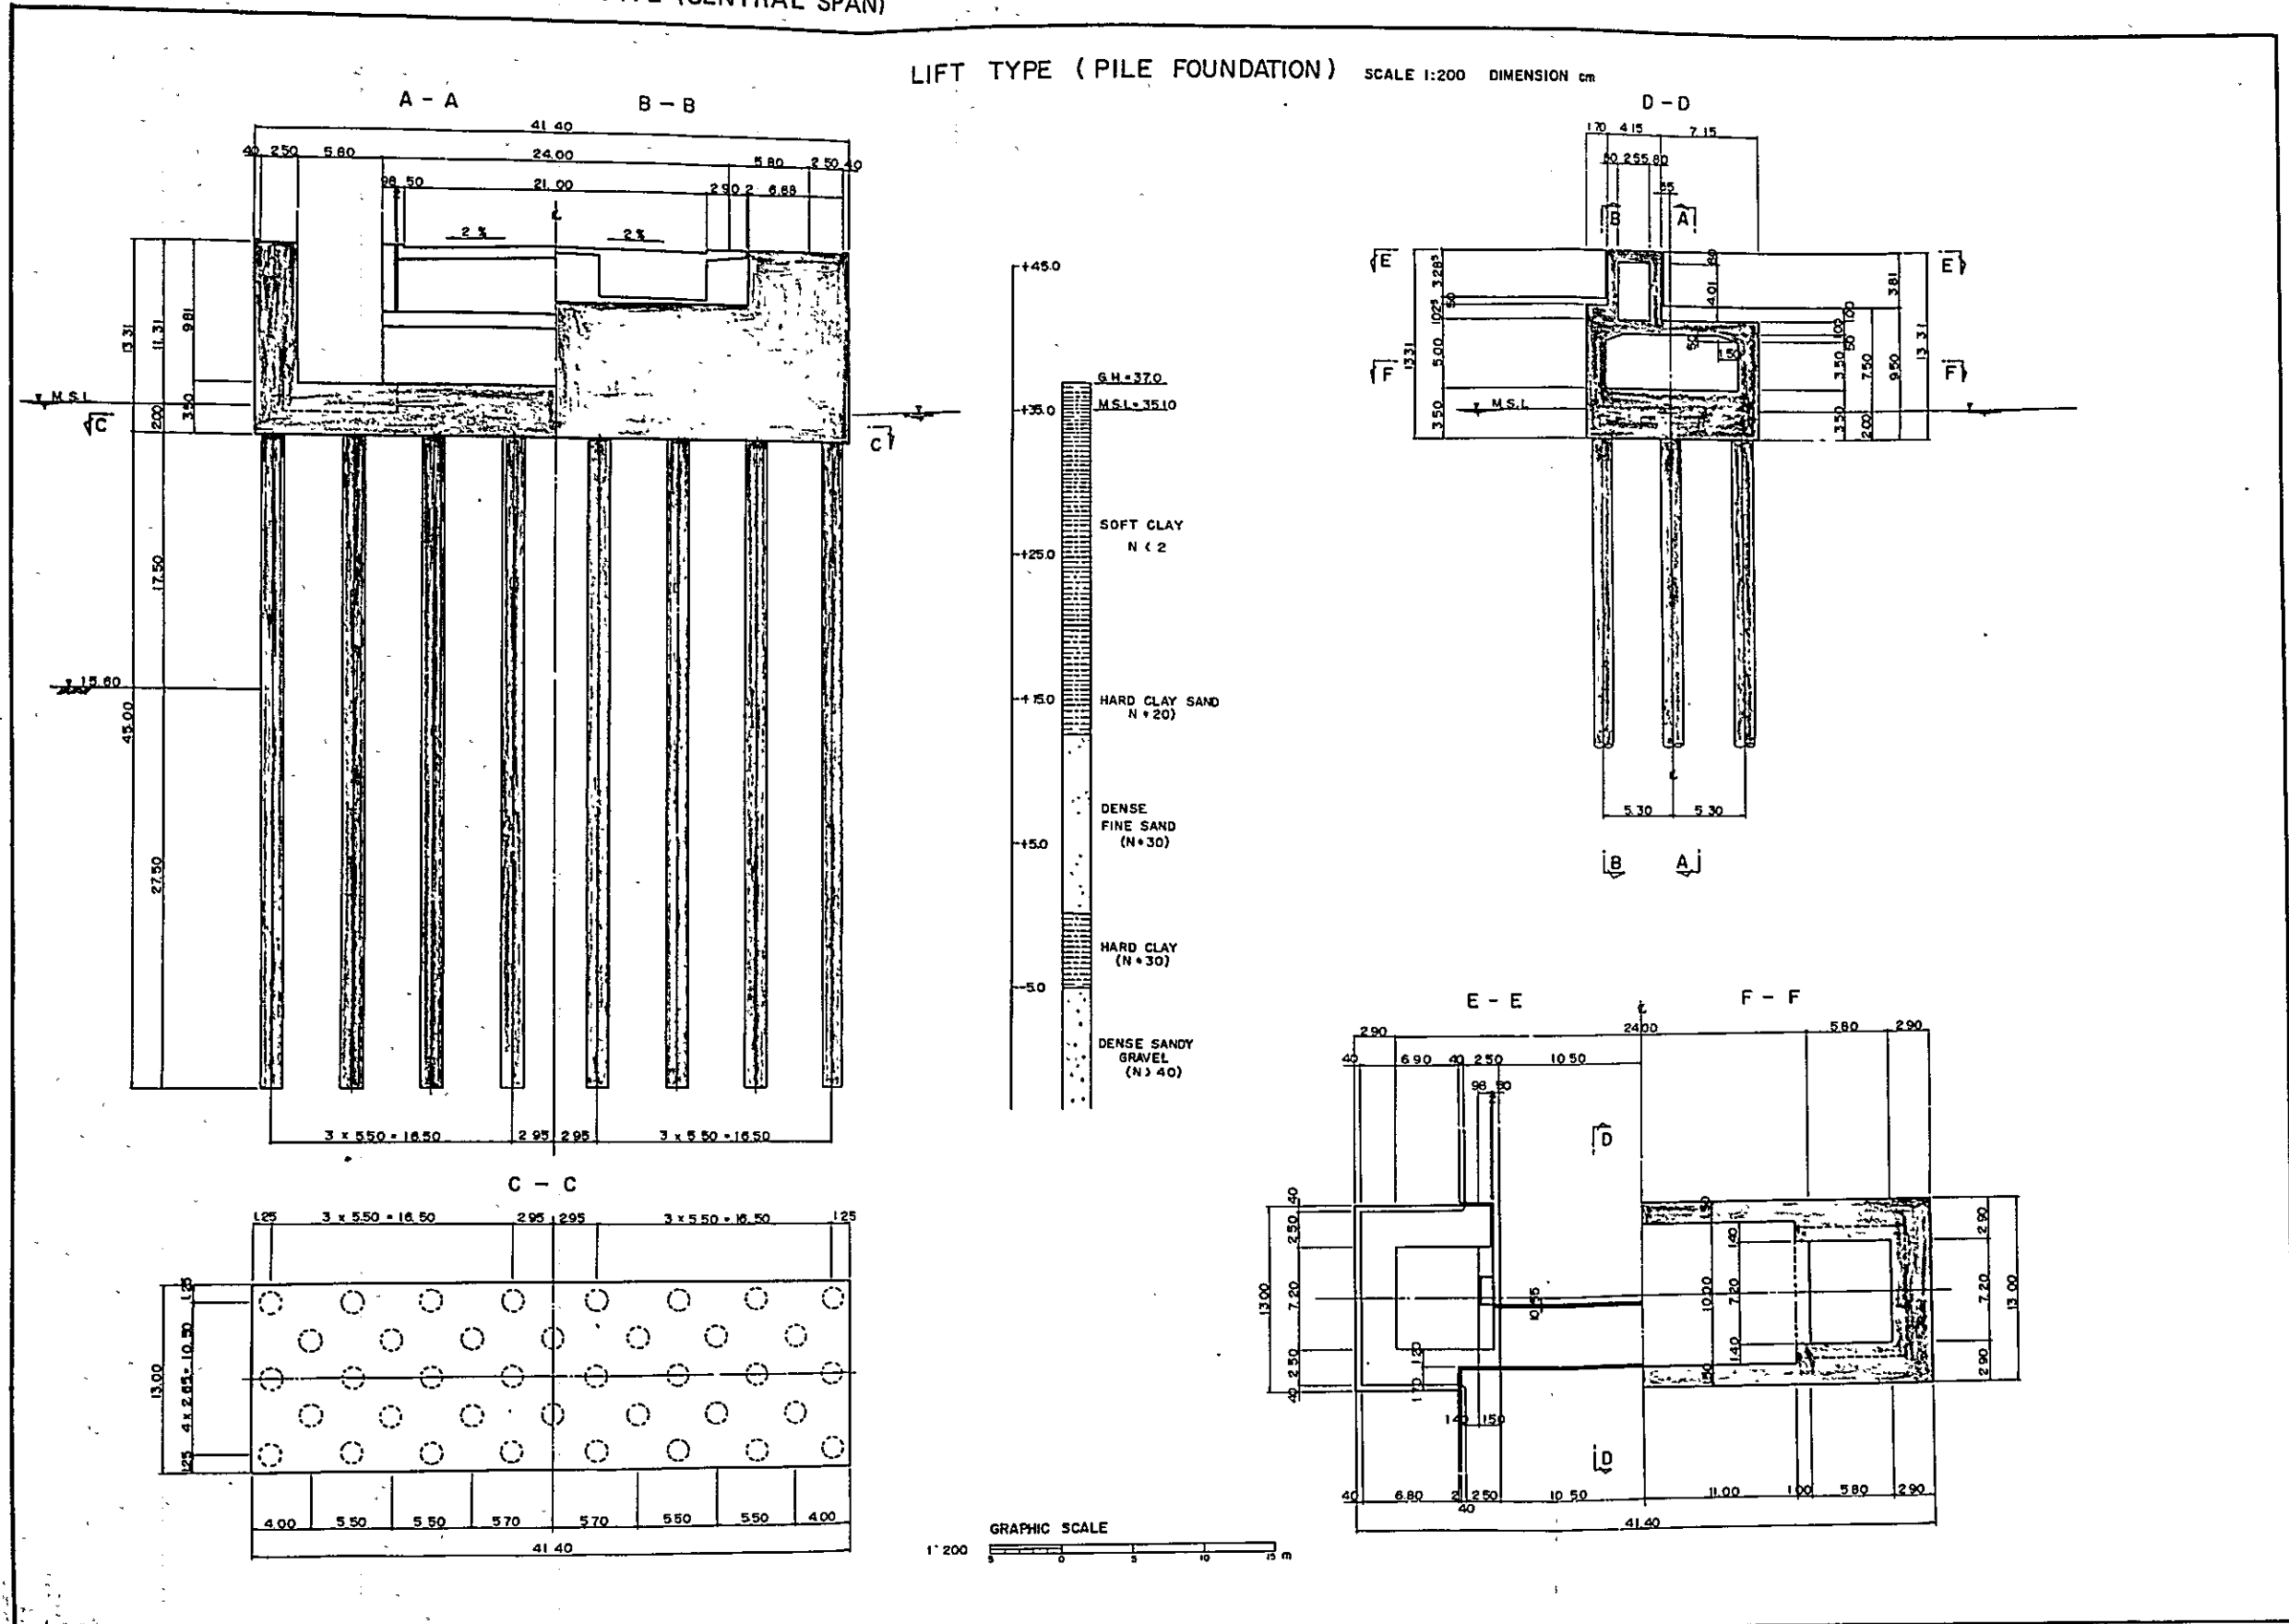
PILE FOUNDATION FOR LIFT TYPE (CENTRAL SPAN)
